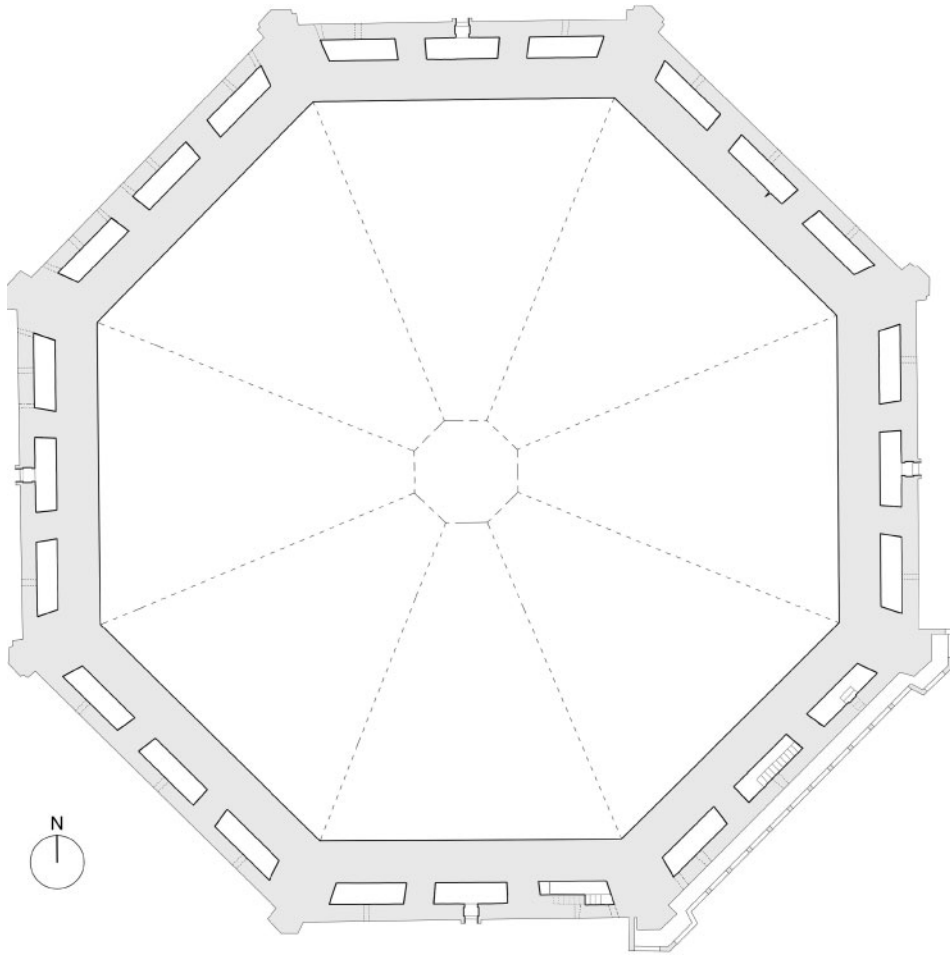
The plan of the Brunelleschi's dome shows the box structure formed by the inner dome, ribs and the outer dome.
